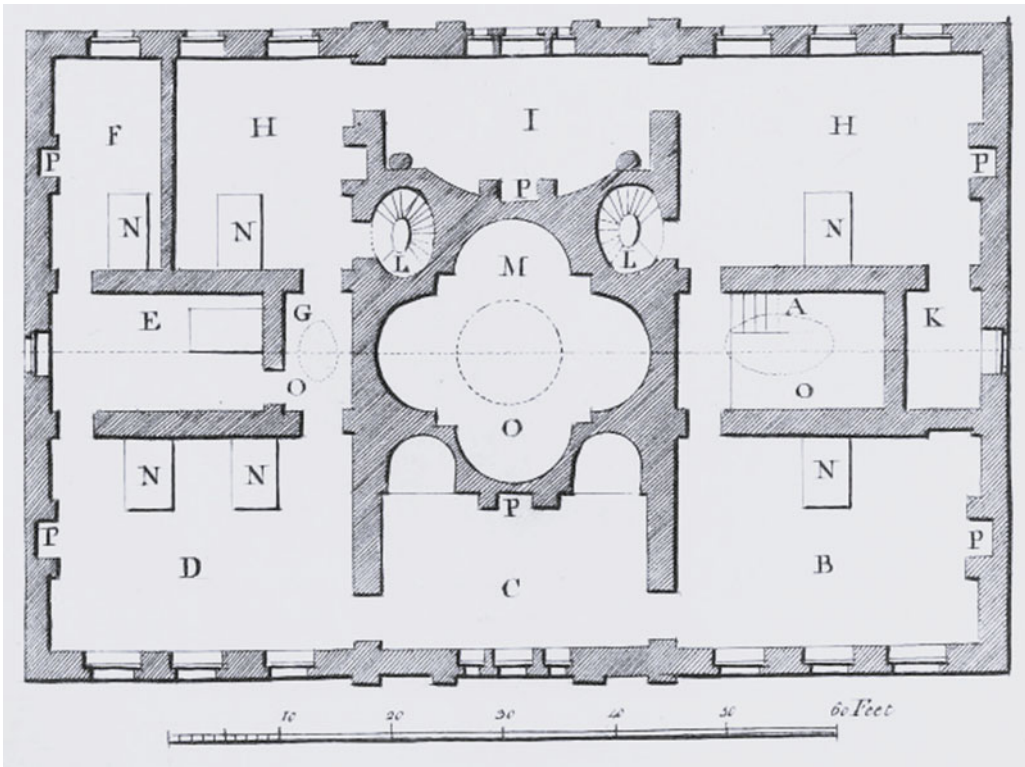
John Carter, plan of the second floor of Bywell Hall, from *Builder's Magazine* 1776, pl LXXXVI.
